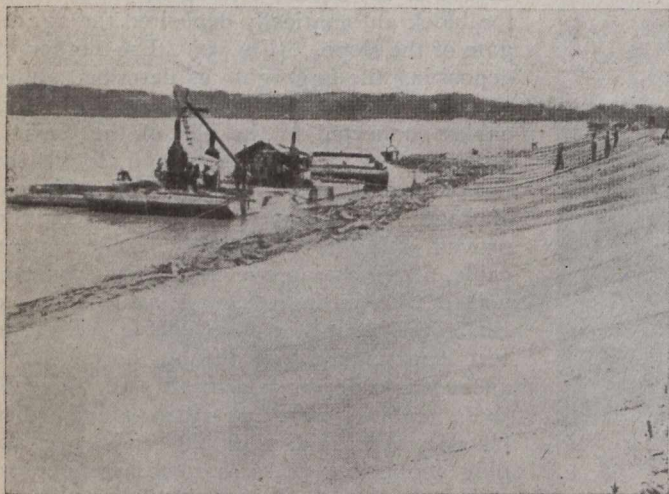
Concrete Mixer and Delivery Plant; Also Completed Section of Paving
